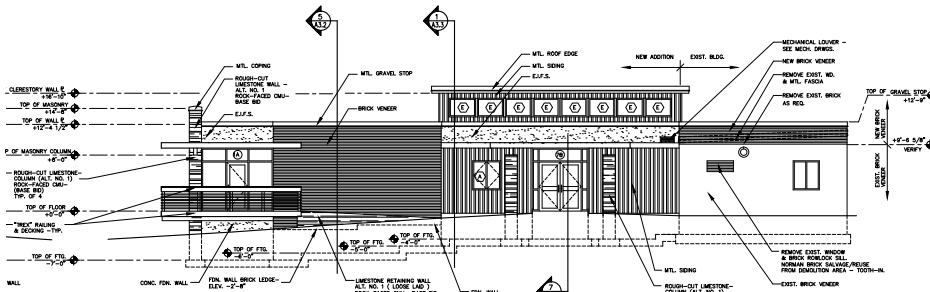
LONI South Elevation. From Waggoner and Wineinger Architects.
